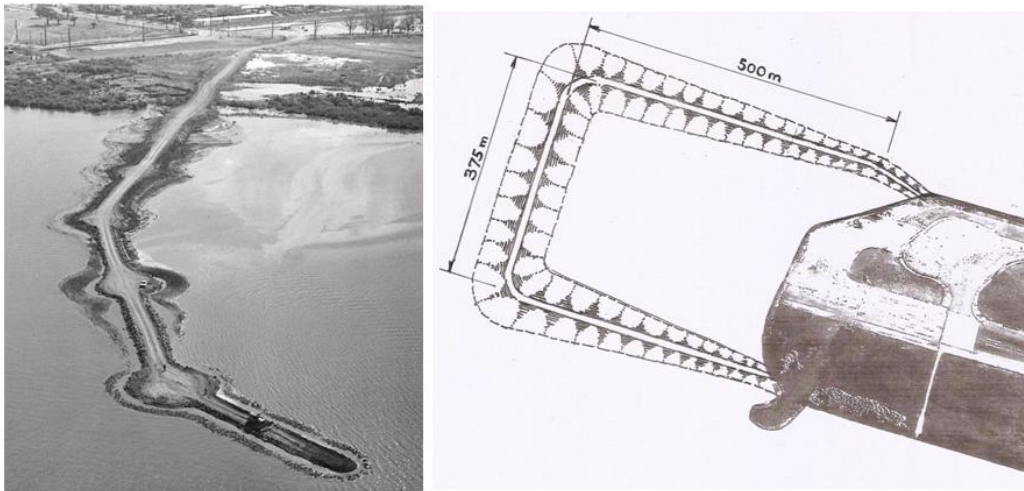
Dry-filling method for landfill within the proposed expansion area (photo – construction of Causeway Road).
